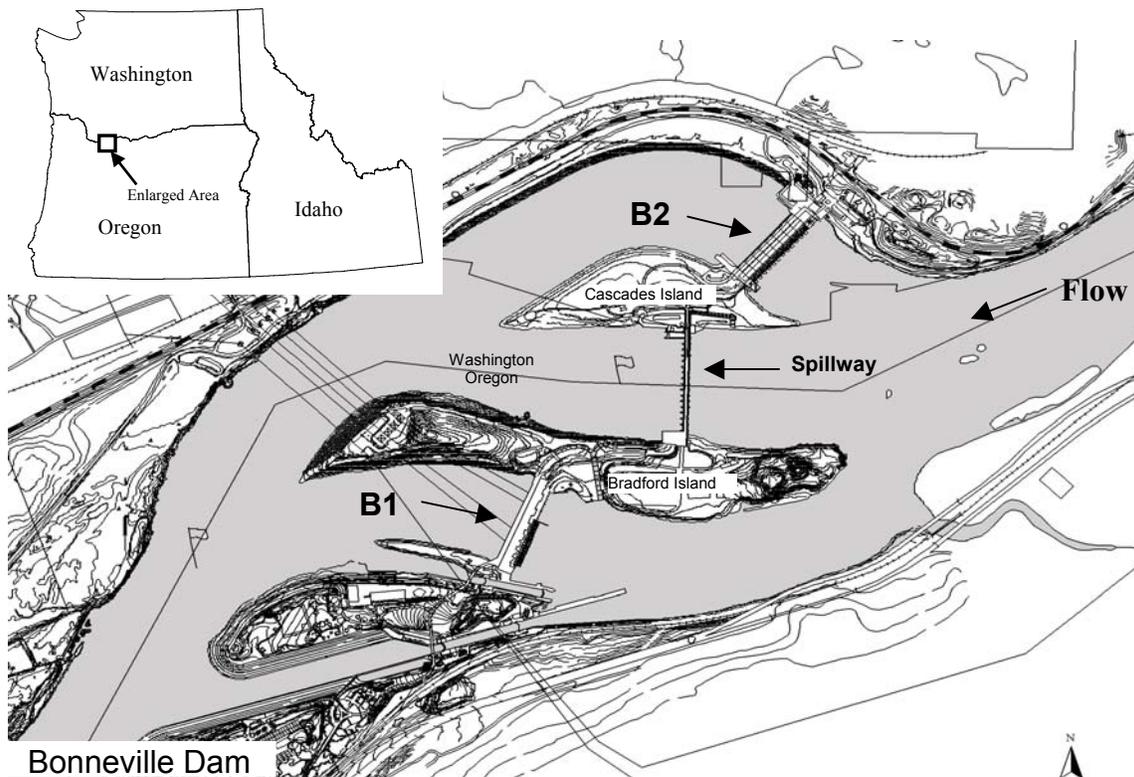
Plan view of Bonneville Dam on the Columbia River, showing the first powerhouse (B1), spillway, and second powerhouse (B2).
